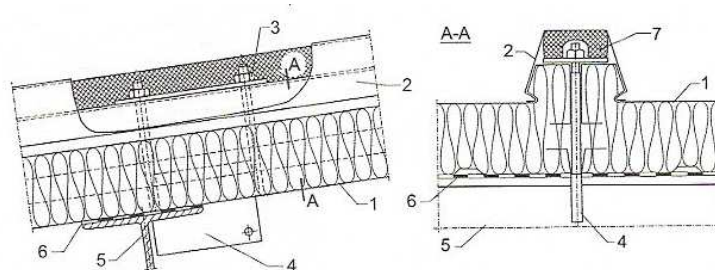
Laminated panel to purlin connection: 1- laminated panel, 2- finishing profile, 3- bolt, 4- cleat, 5- purlin, 6- foil strip, 7- polyurethane seal
